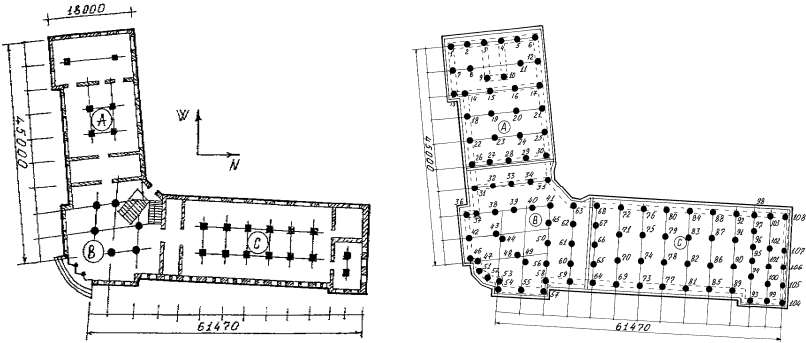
Plan of the first floor of the bank building. Location of seismic isolation supports in the building plan
